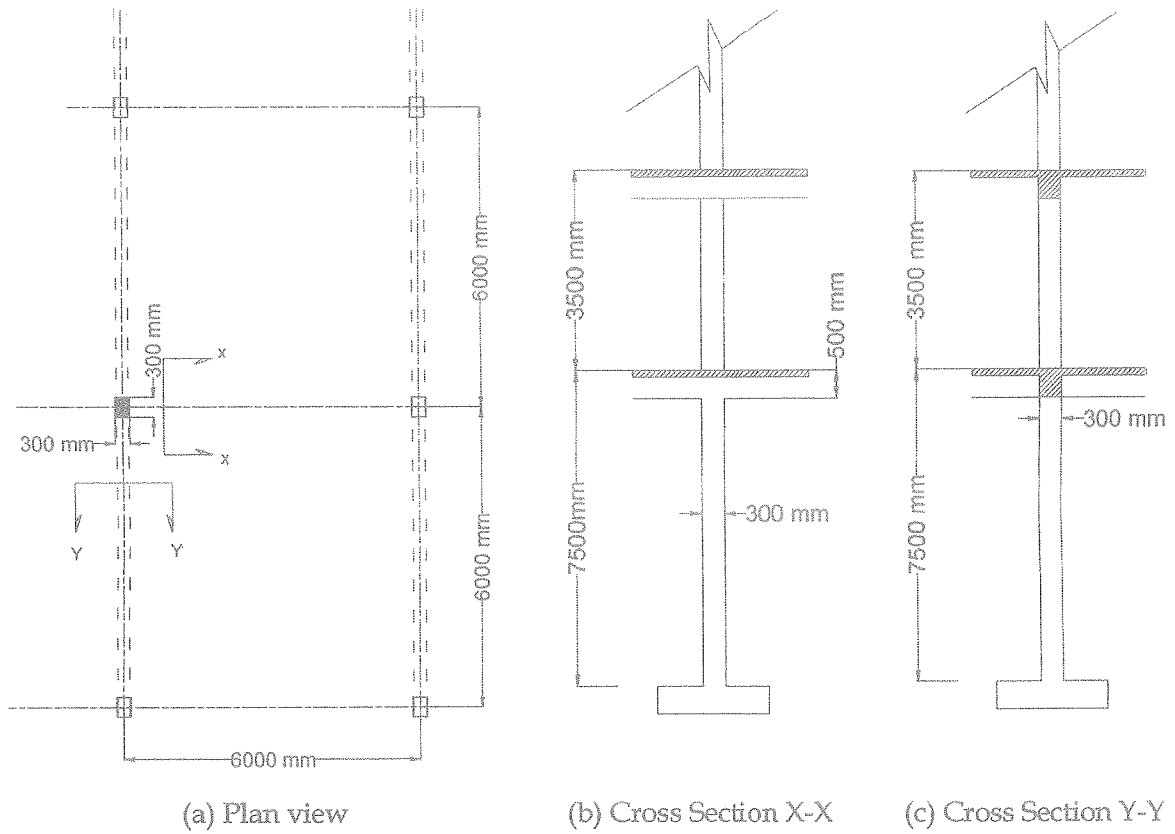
Plan view and cross sections of the ground floor and first floor column
